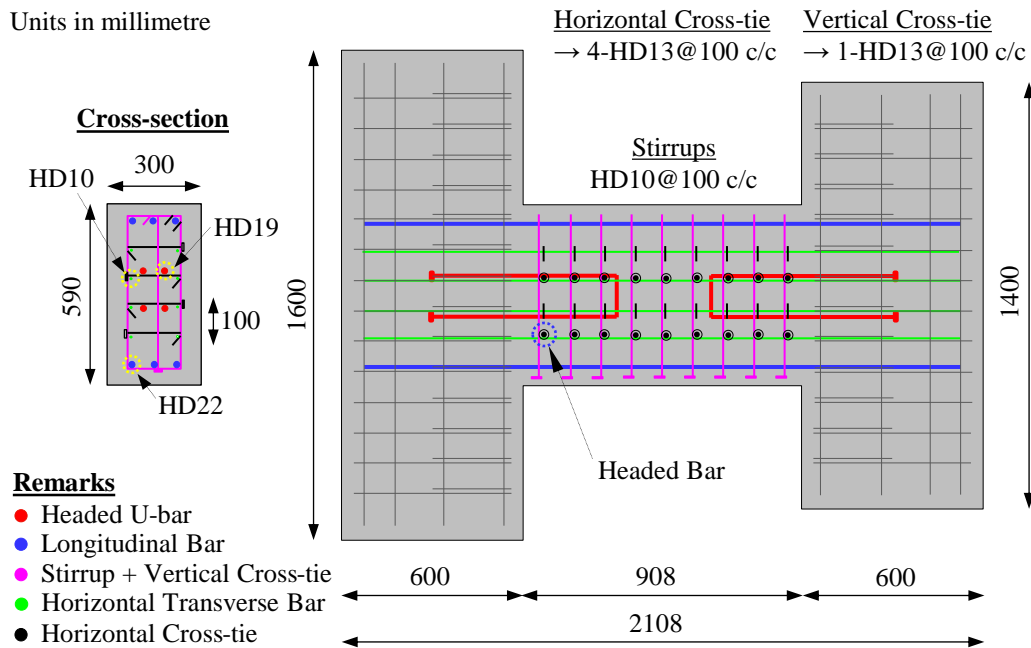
Cross-section details and reinforcement layouts of coupling beam. Adapted from [19].
